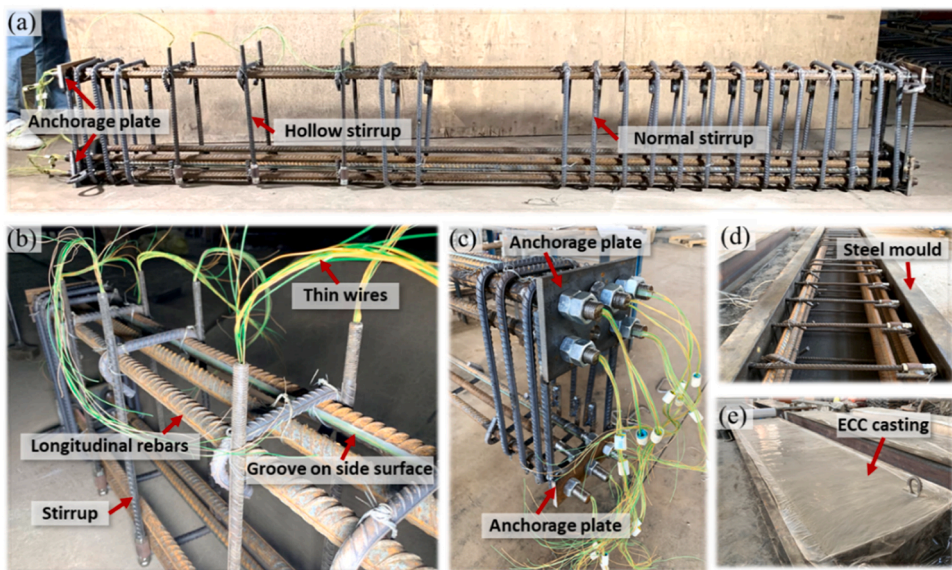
Fabrication of beam specimens: (a) typical reinforcement cage; (b) reinforcement strain-gauging system; (c) reinforcement anchorage; (d) steel mould; (e) beam casting.
